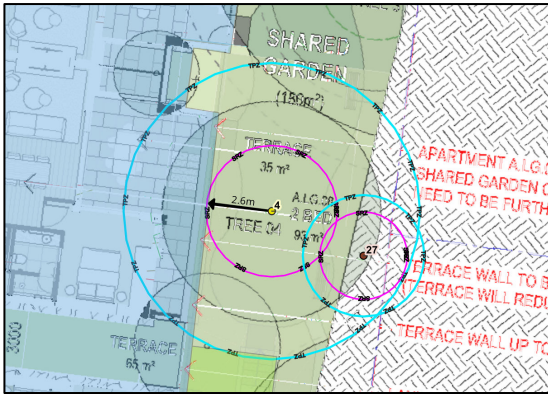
Lower ground floor plan relative to tree. Set back to retaining wall is 2.6m.
